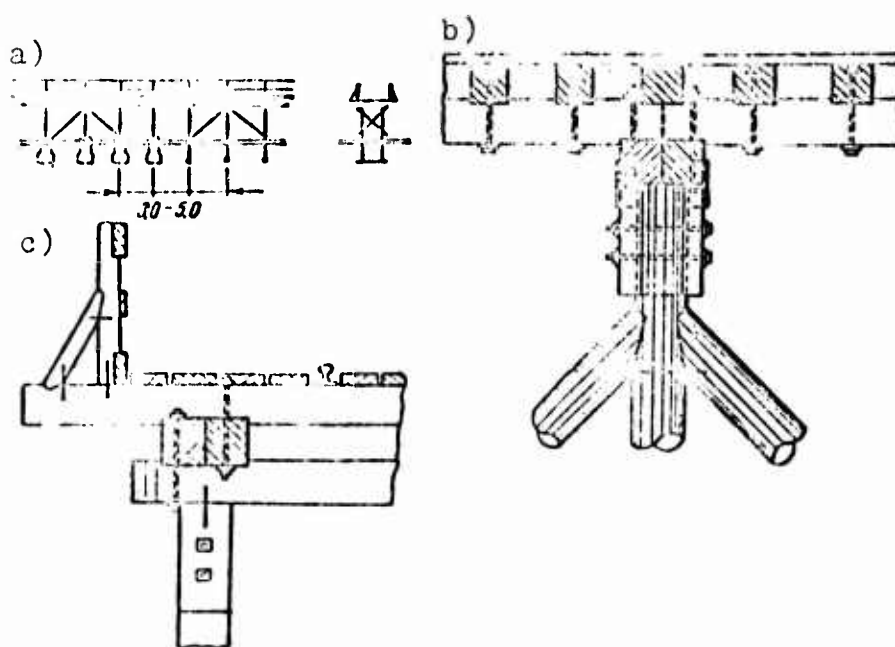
Haulage trestle with wooden supporting designs: a) diagram; b, c) details.
